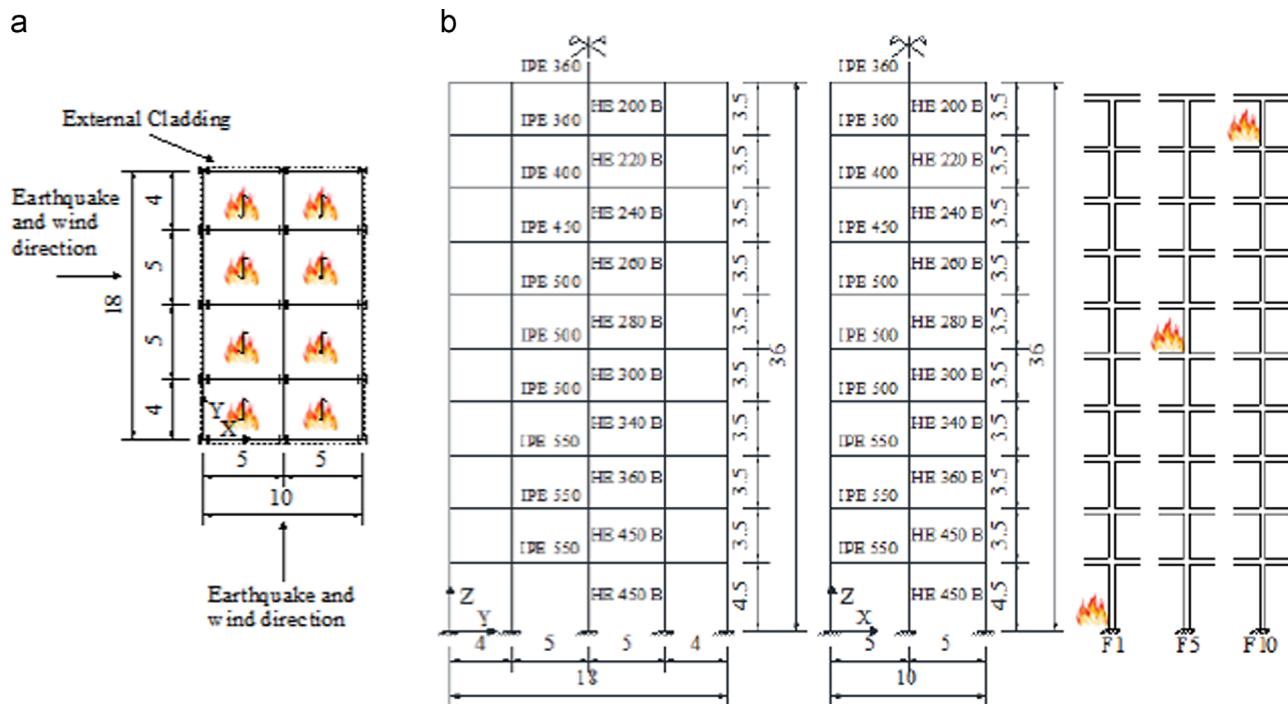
Test structure (units in m). (a) Plan and fire compartment. (b) Elevation and fire scenarios.
